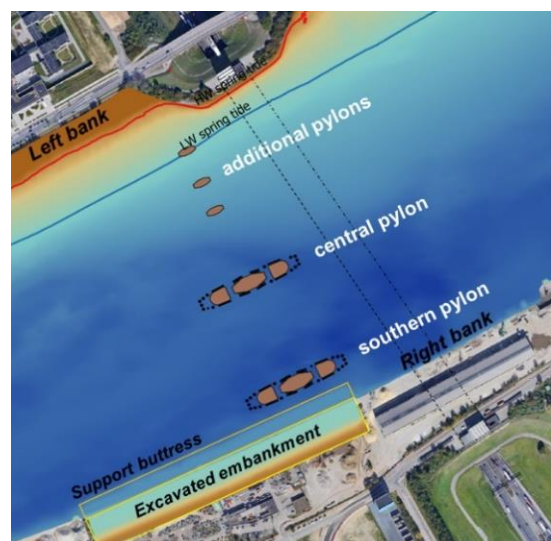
Overview of design scenarios including bridge piers, support buttress and quay wall excavation.
